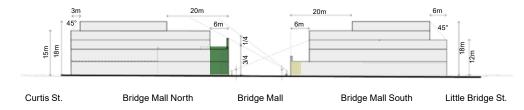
Existing built form section for Sub-Area 2: Bridge Mall Central - Section D
